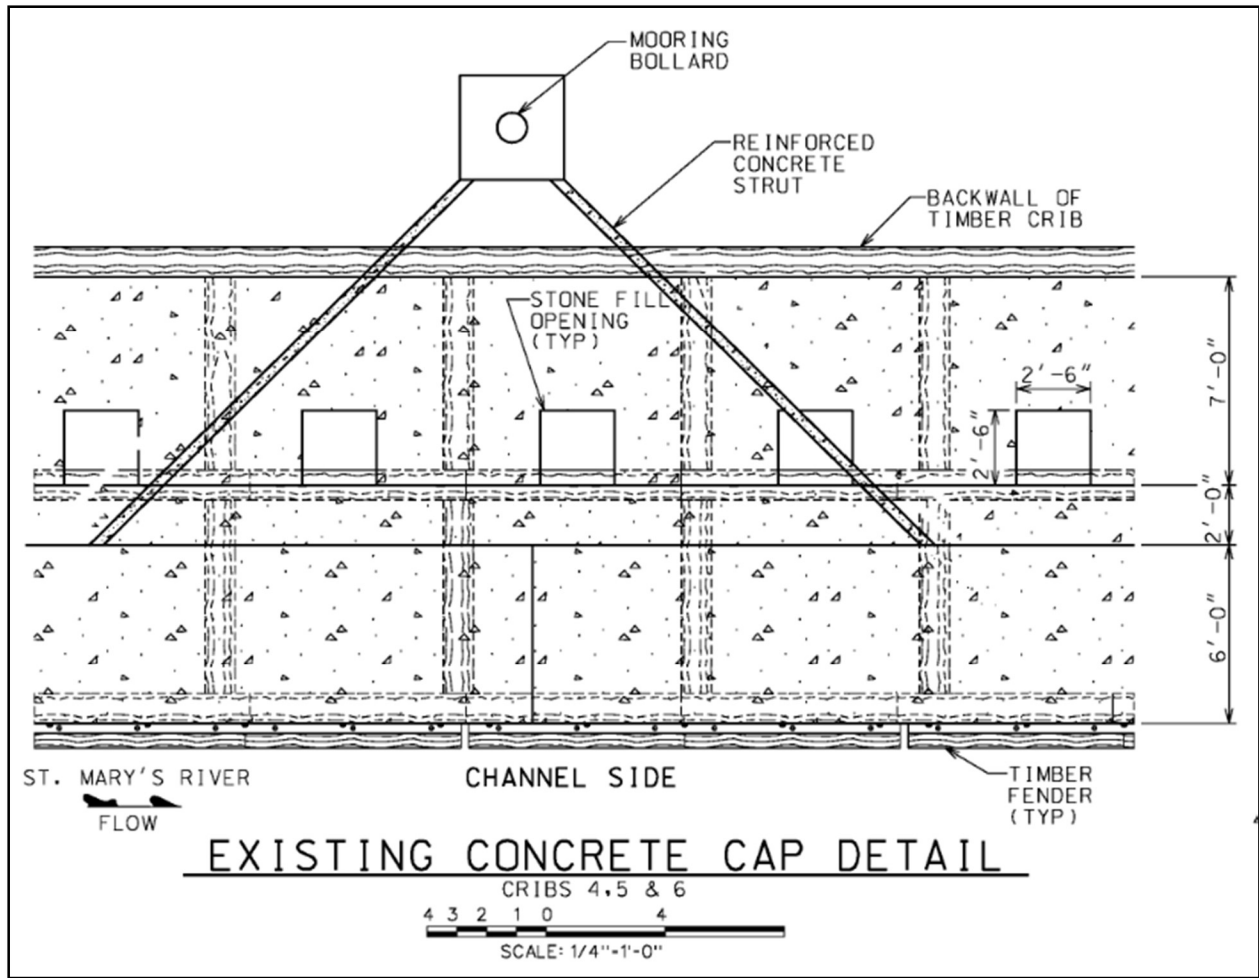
2002 WCP S. Wall Rehab (plans showing assumed existing detail of crib 6 with concrete struts at bollards.)
